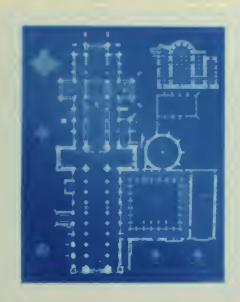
Plan of Worcester Cathedral showing Chapter-House.
